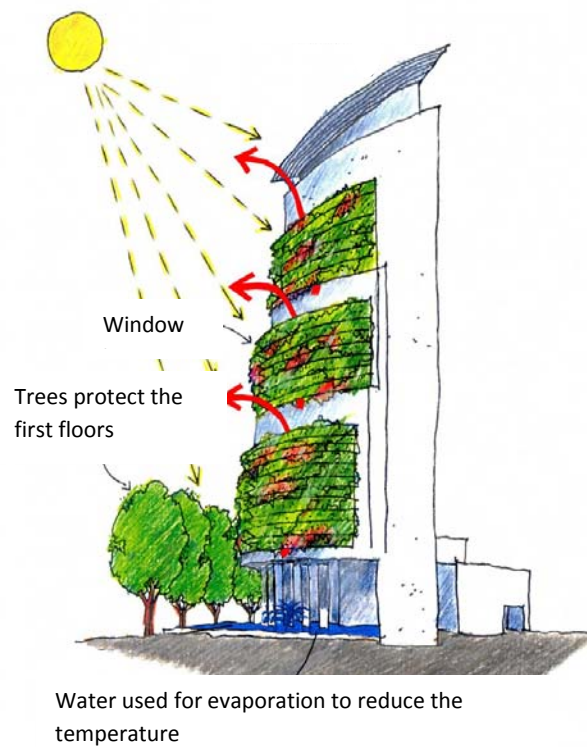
Concept drawing for the green façade. (Pastorelli, 2009).
